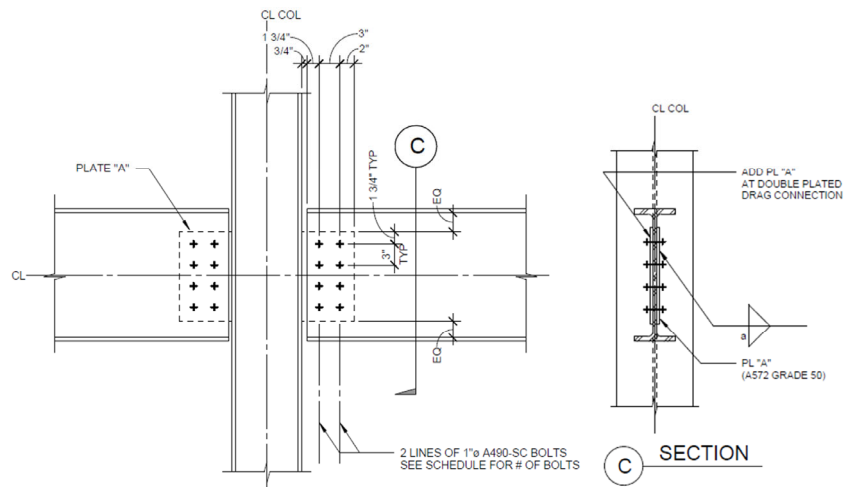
Double Shear Tab Collector Connection (Courtesy of The Herrick Corporation)
